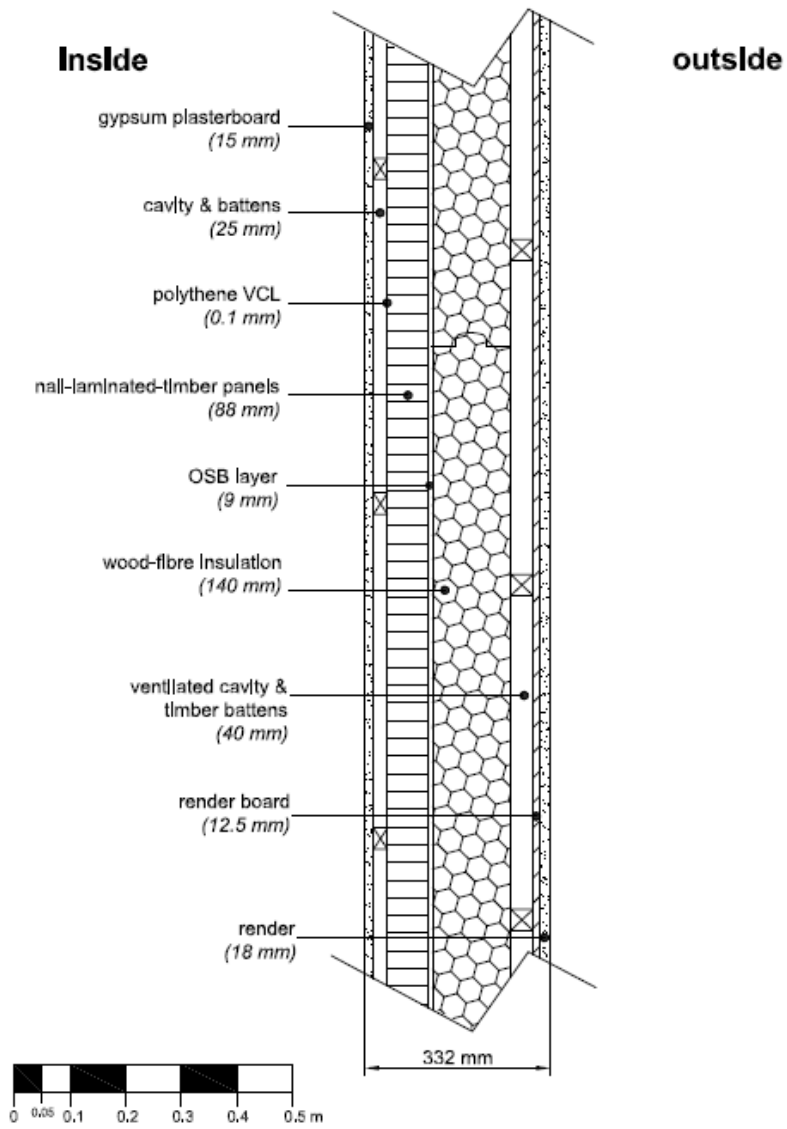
Wall E1 (nail-laminated timber (NLT), external solution: render on boards), horizontal section.
